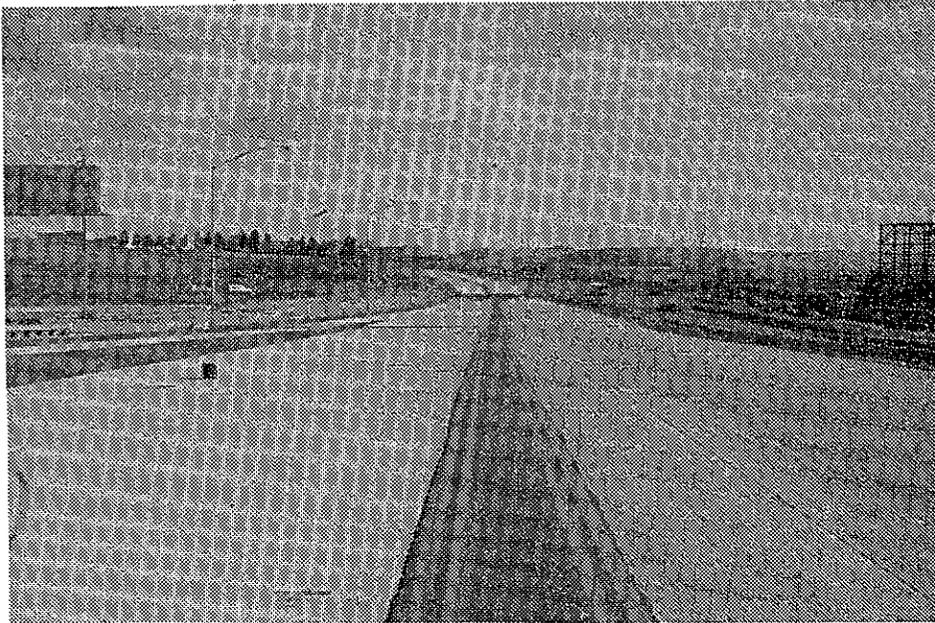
Looking south along Route 5. Note displacement of striping to right (west) caused by Juvenile Hall slide.
